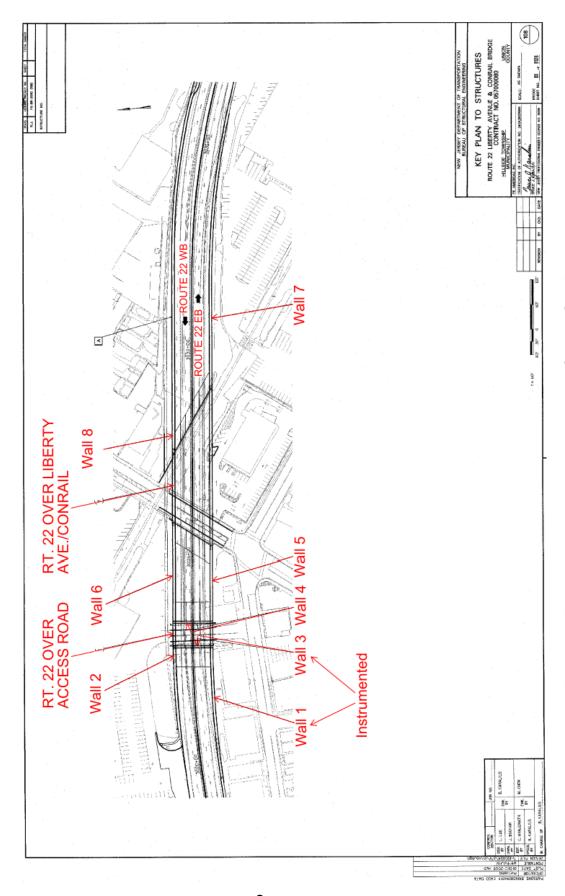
Route 22 over Liberty Avenue and Conrail Site Plan
